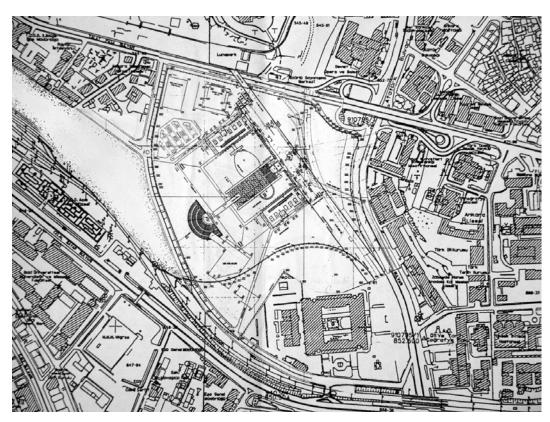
The future plan of the service area (obtained by overlapping project plan and 1997 plan)
